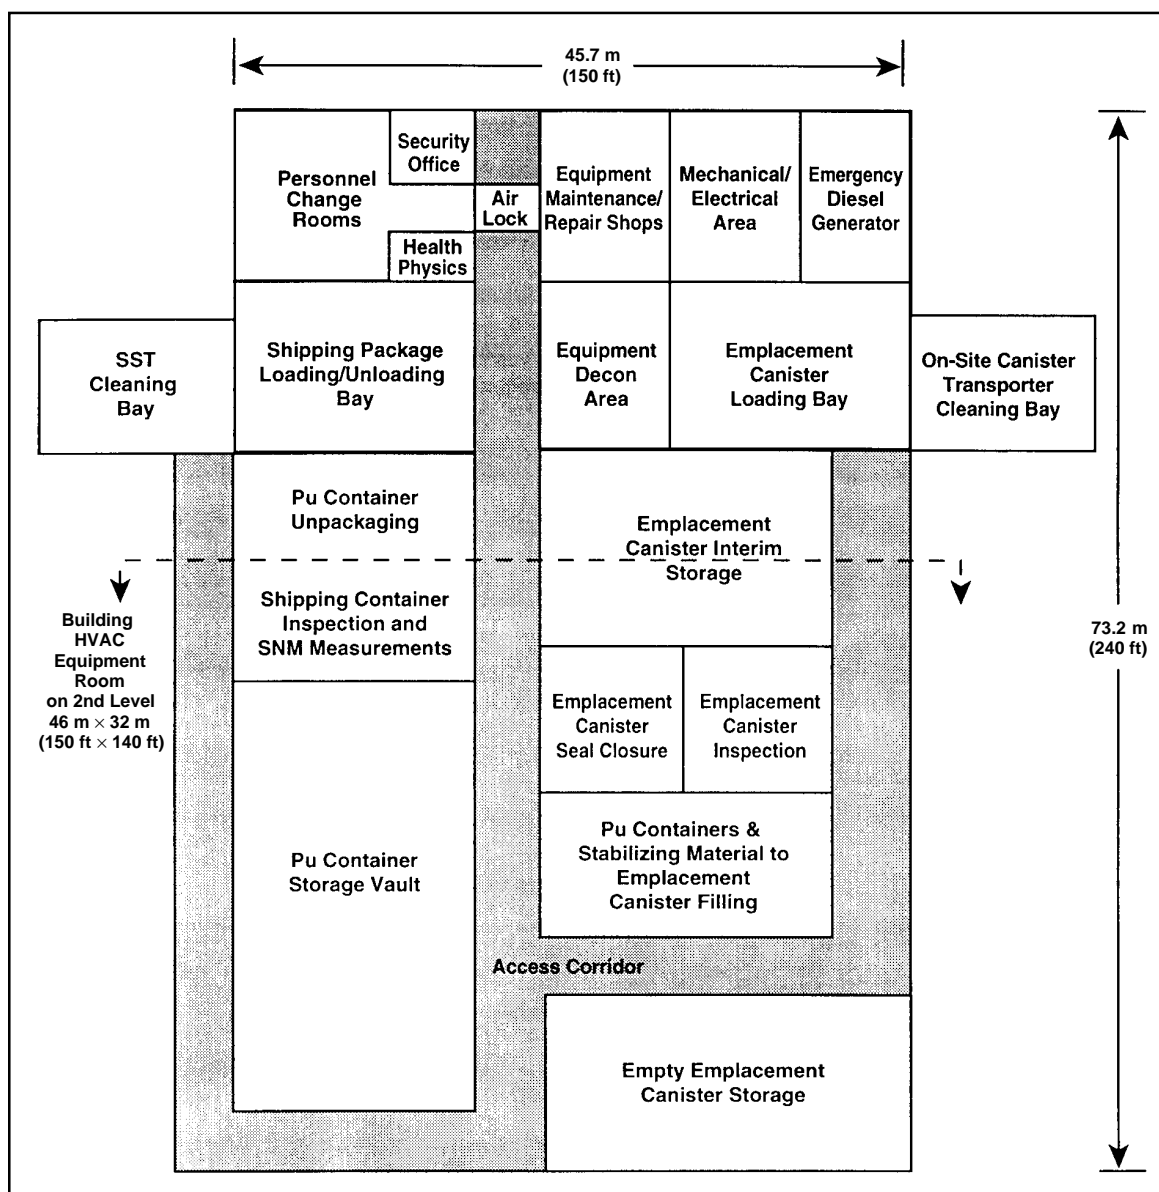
Surface Processing Facility—Receiving Sub-Facility Plot Plan.
